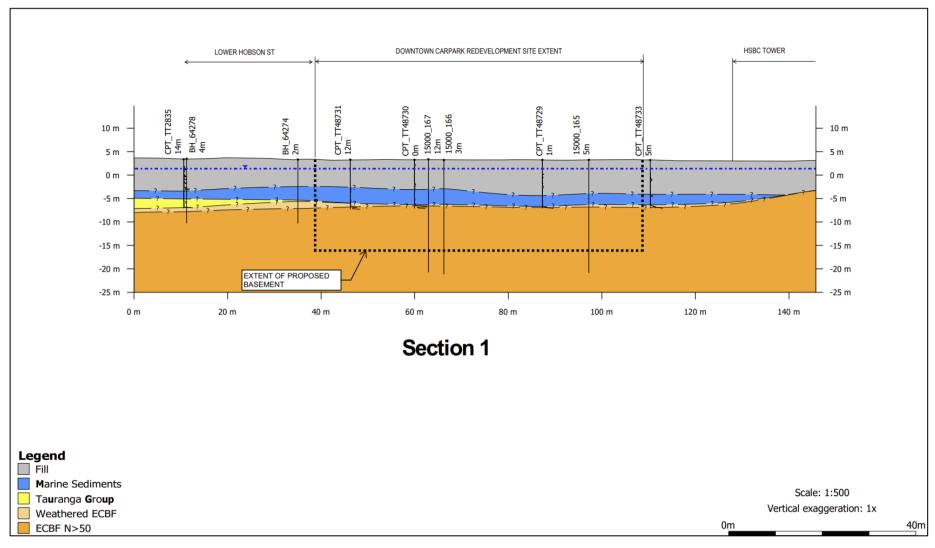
Proposed excavation depth for the redevelopment works with the Project Area (Downtown Carpark) indicated (source: Tonkin & Taylor)
